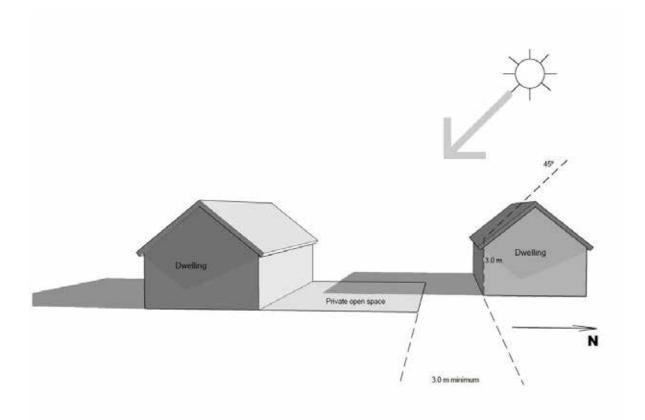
Separation from the private open space of another dwelling on the same site as required by clause 10.4.4 A1(a)
